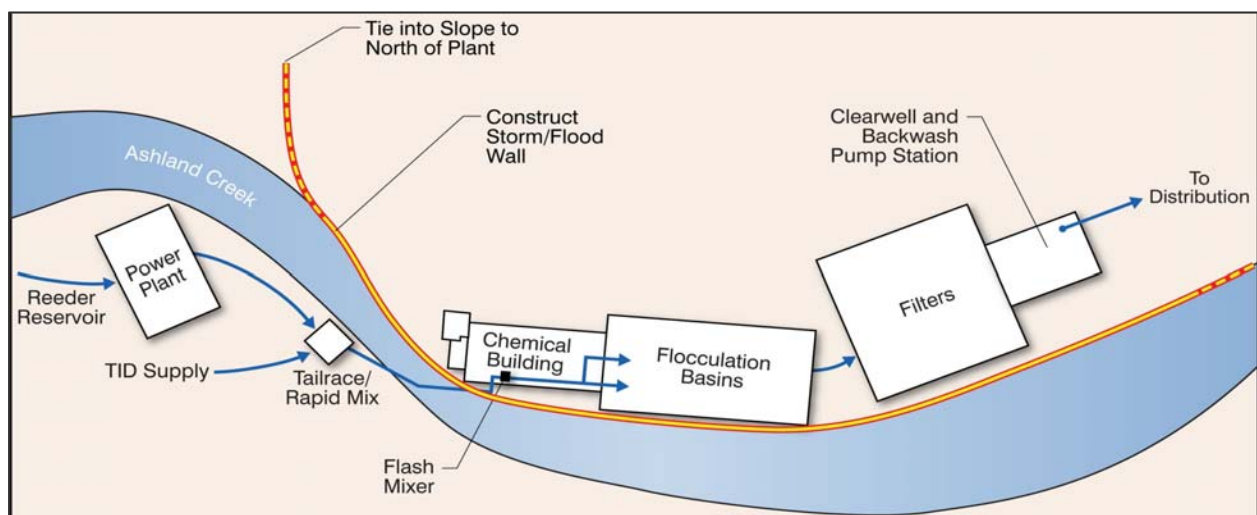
Proposed Water Treatment Plant Flood Wall (Carollo, 2010)
